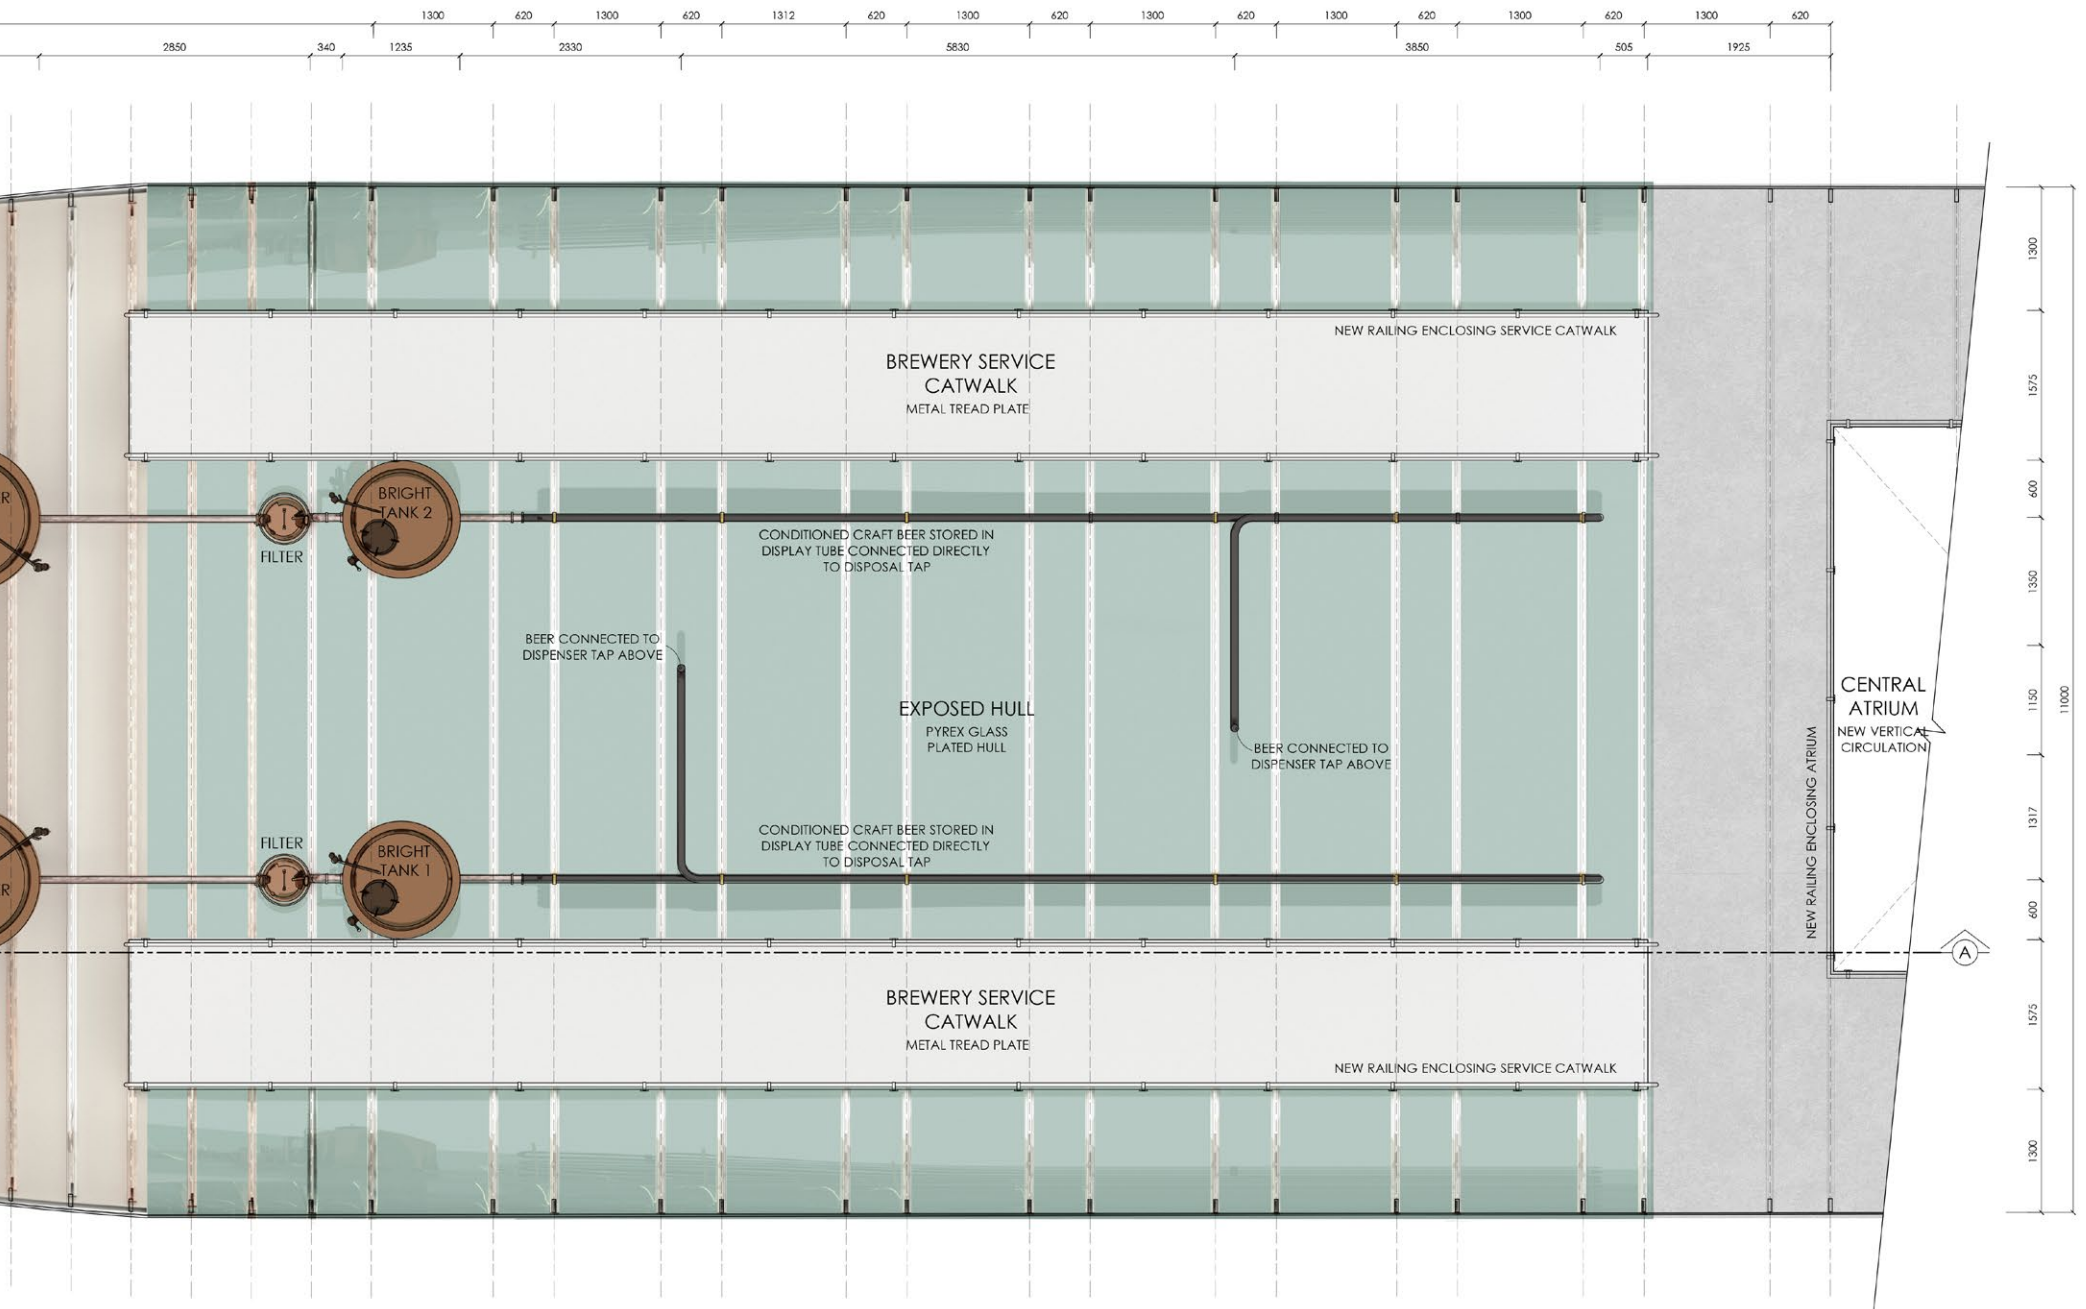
Proposed Lower Level Layout of Brewery (Author, 2016)
